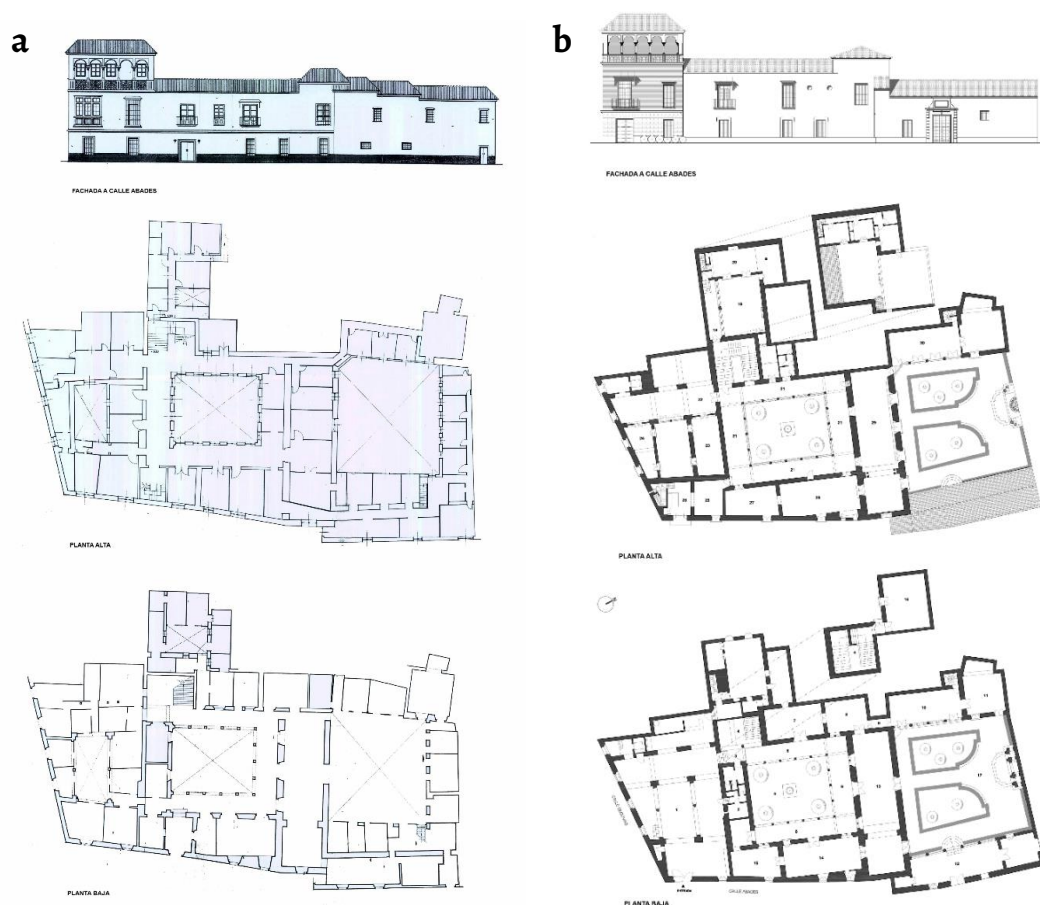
Elevation and floor plans of Pensión Don Marcos: *a*) based on Jesús Gómez-Millán drawing (1964) [15]; *b*) current state. Authors' drawing (2021).
